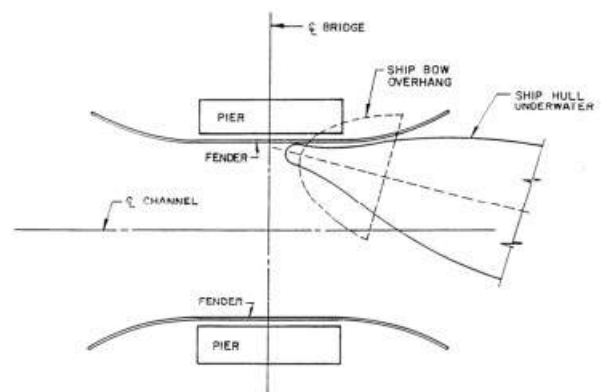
Plan of Ship Bow Overhang Impacting Pier
